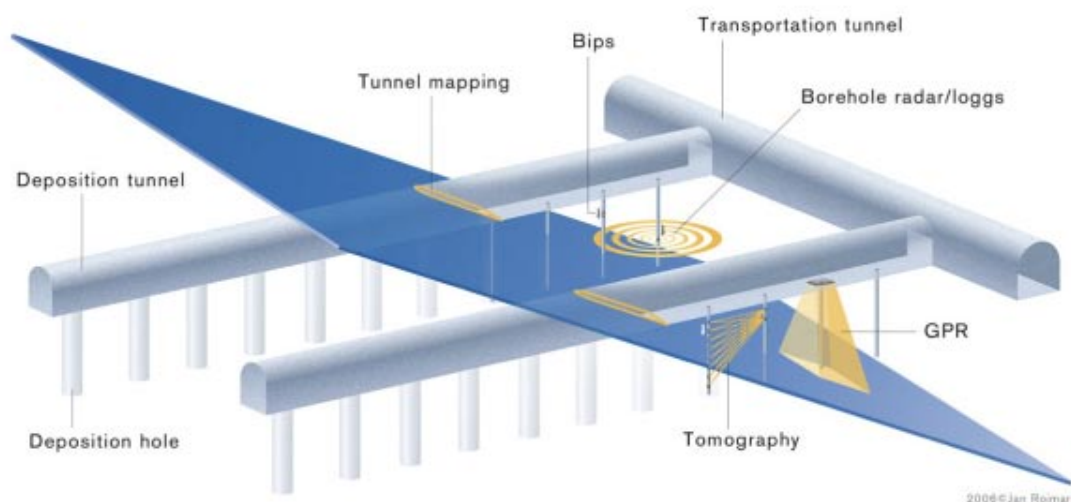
The surface investigation of the deposition tunnel walls and floor.
